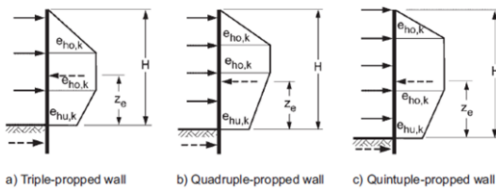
Pressure diagrams for triple- and multiple-supported sheet pile walls and in-situ concrete walls
